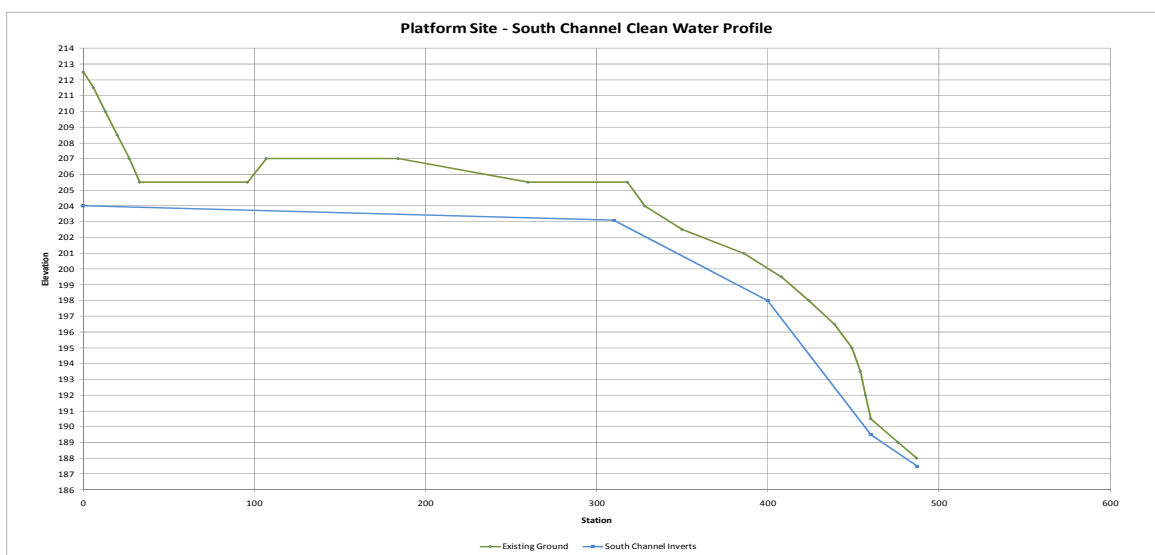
South Diversion Ditch (Ore Stockpile Platform)
